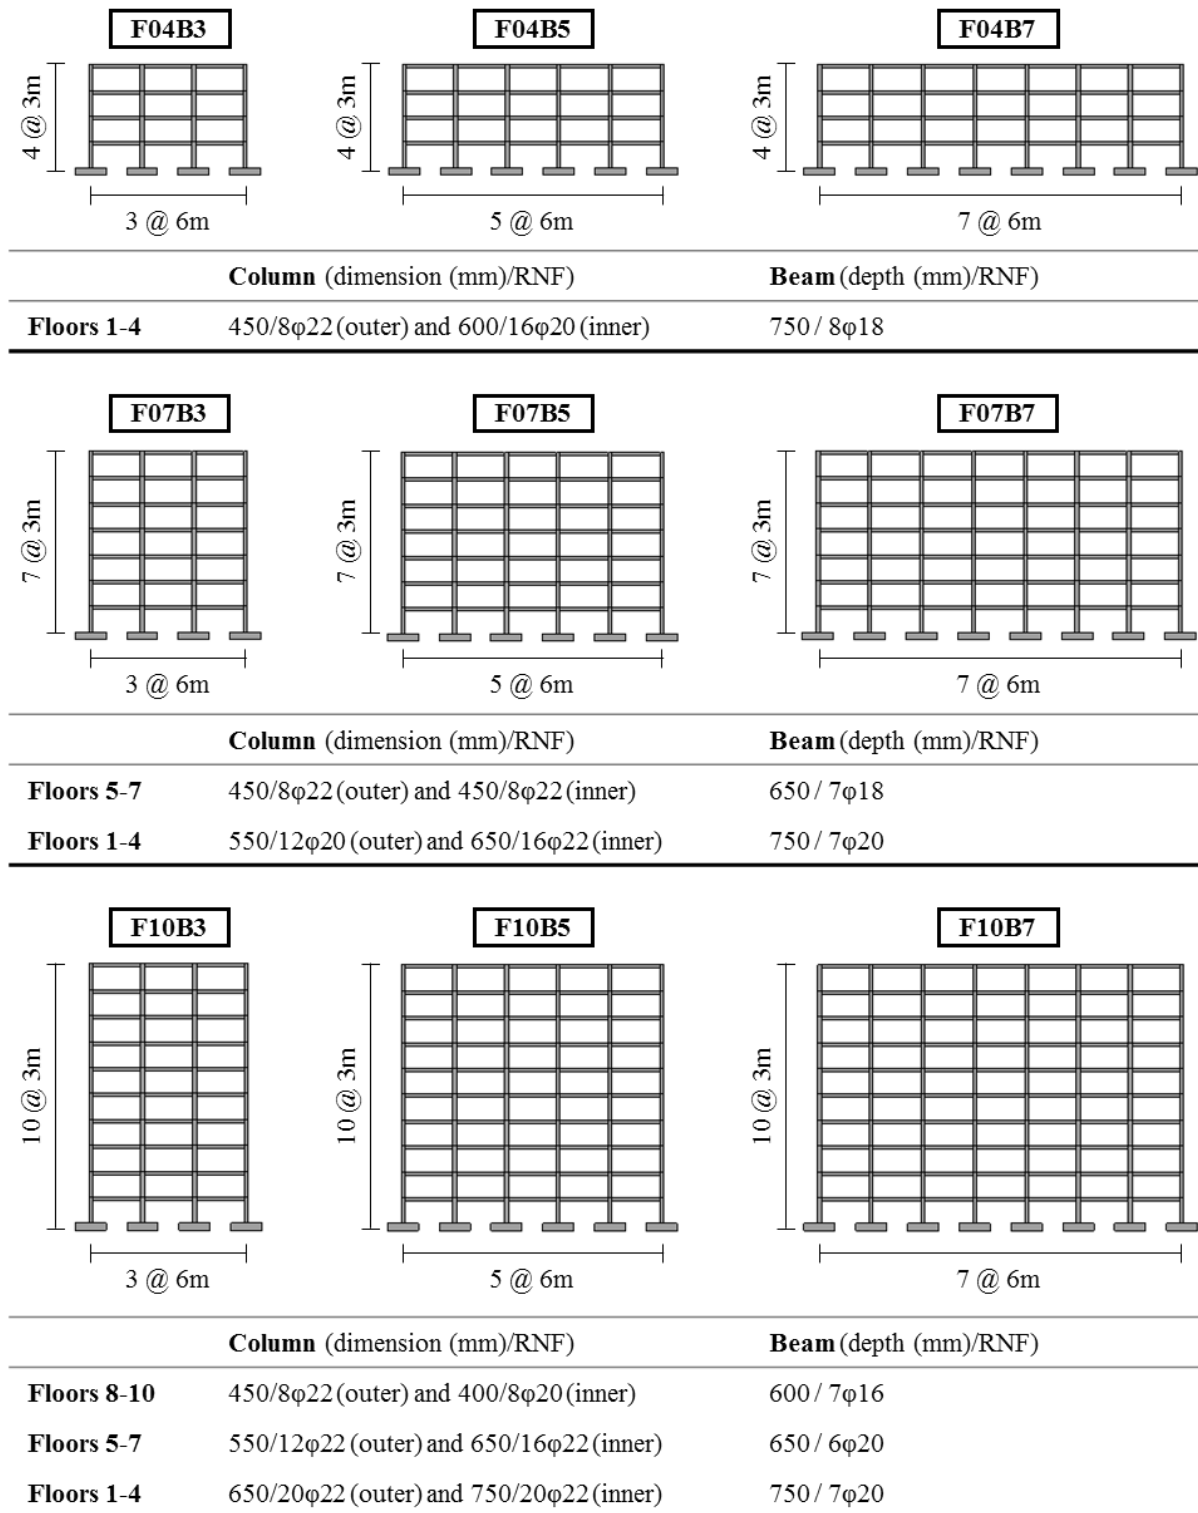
Prototype buildings' configurations, members' cross-sections and reinforcement
